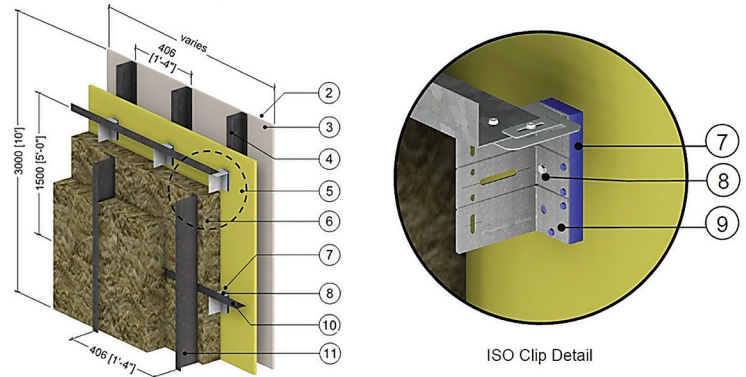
Exterior insulated steel-stud wall assembly capable of receiving adhered thin-stone masonry veneers.
